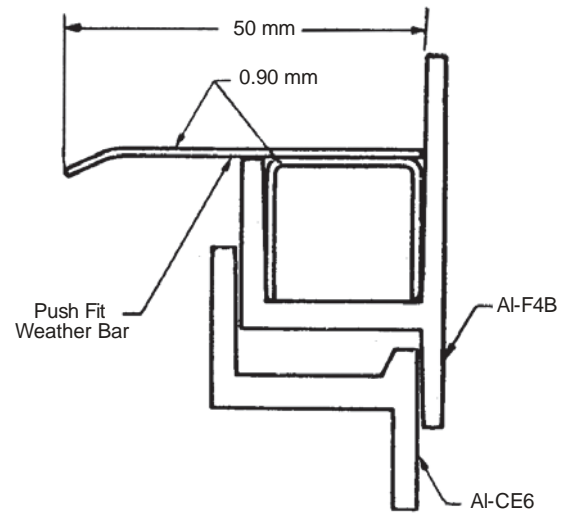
Weather Bar over Extruded Opening Shutter with Fixed Light Above
